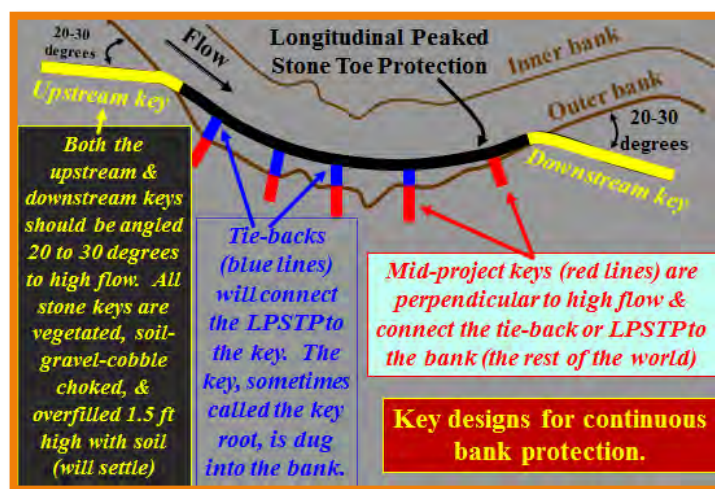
Key installation connected to Longitudinal Peaked Stone Toe Protection (LPSTP). Derrick.
